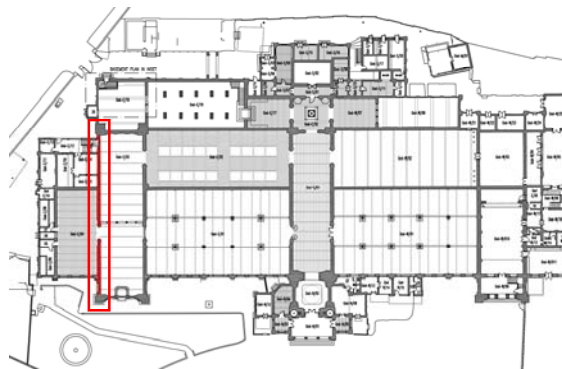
Key Plan showing wall Gnd-E/03-E-W
